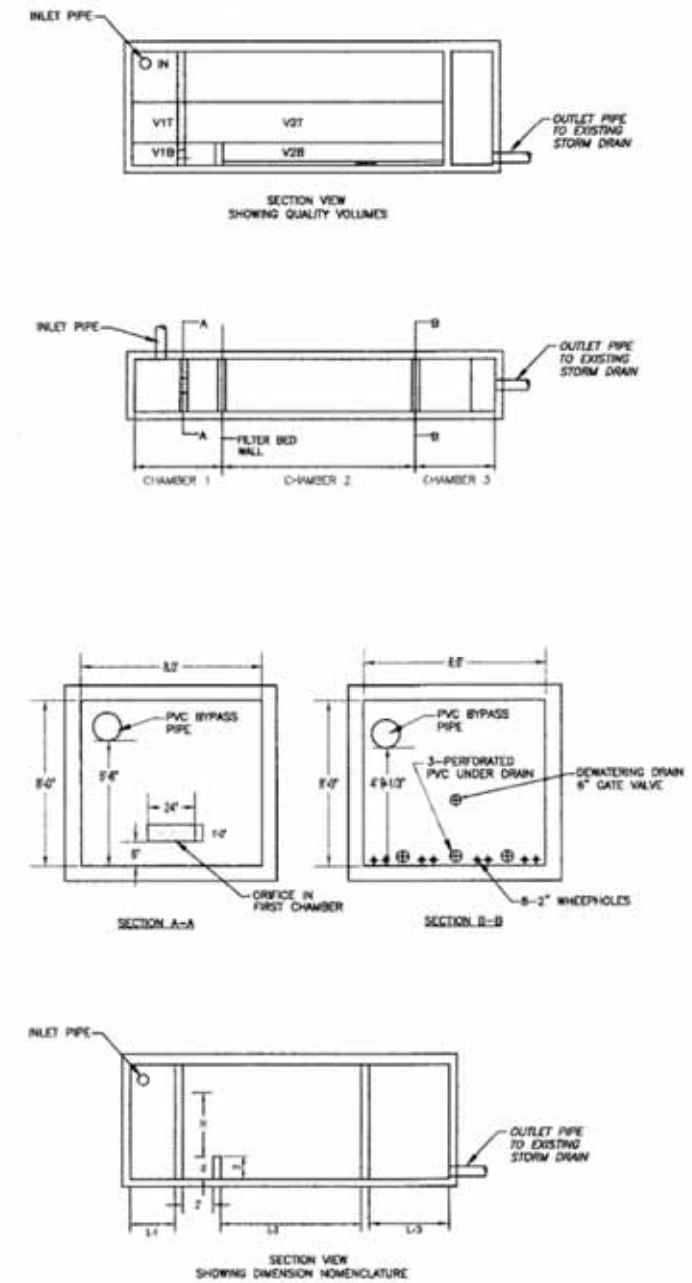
Plan and Section Detail of the Existing Three Chamber Sandfilter
